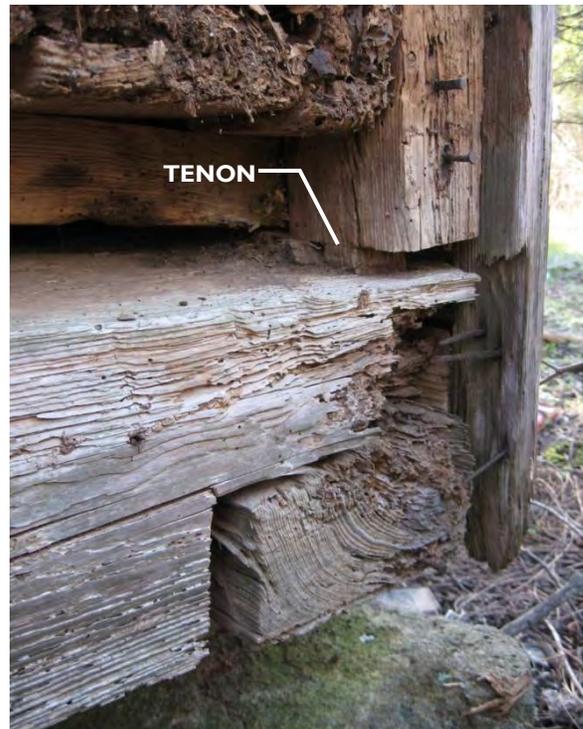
Tenant Cabin. Northeast corner framing at sill. Note mortise and tenon connection at stud to sill.
